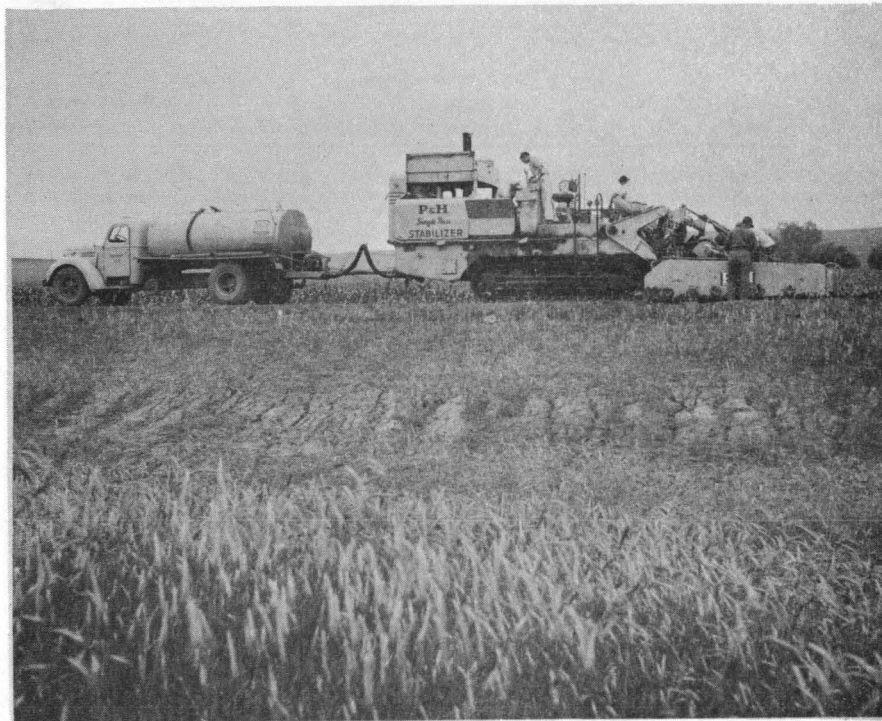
The P & H machine and tank truck containing the Dow ET-506 mixture.
